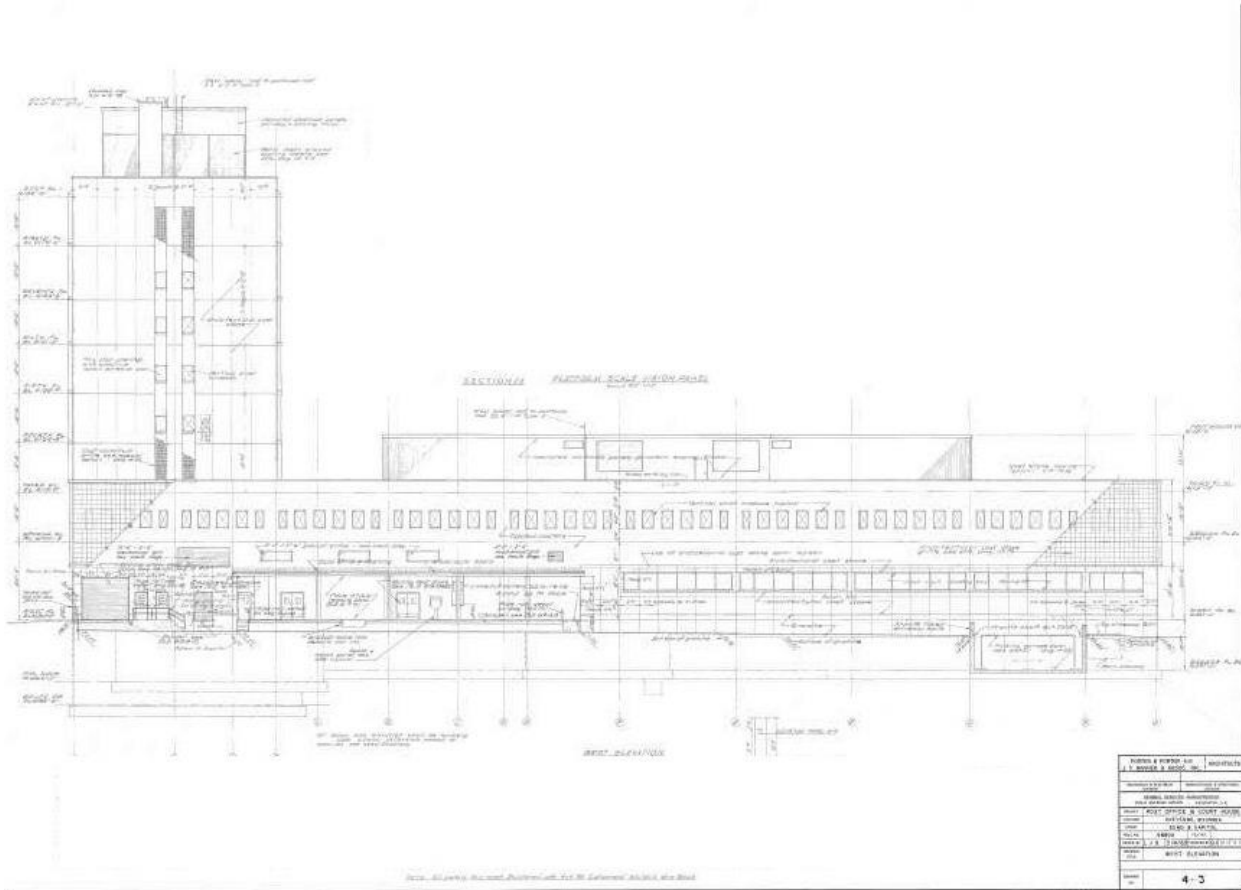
United States Post Office and Court House 1963 Plans, West Elevation
